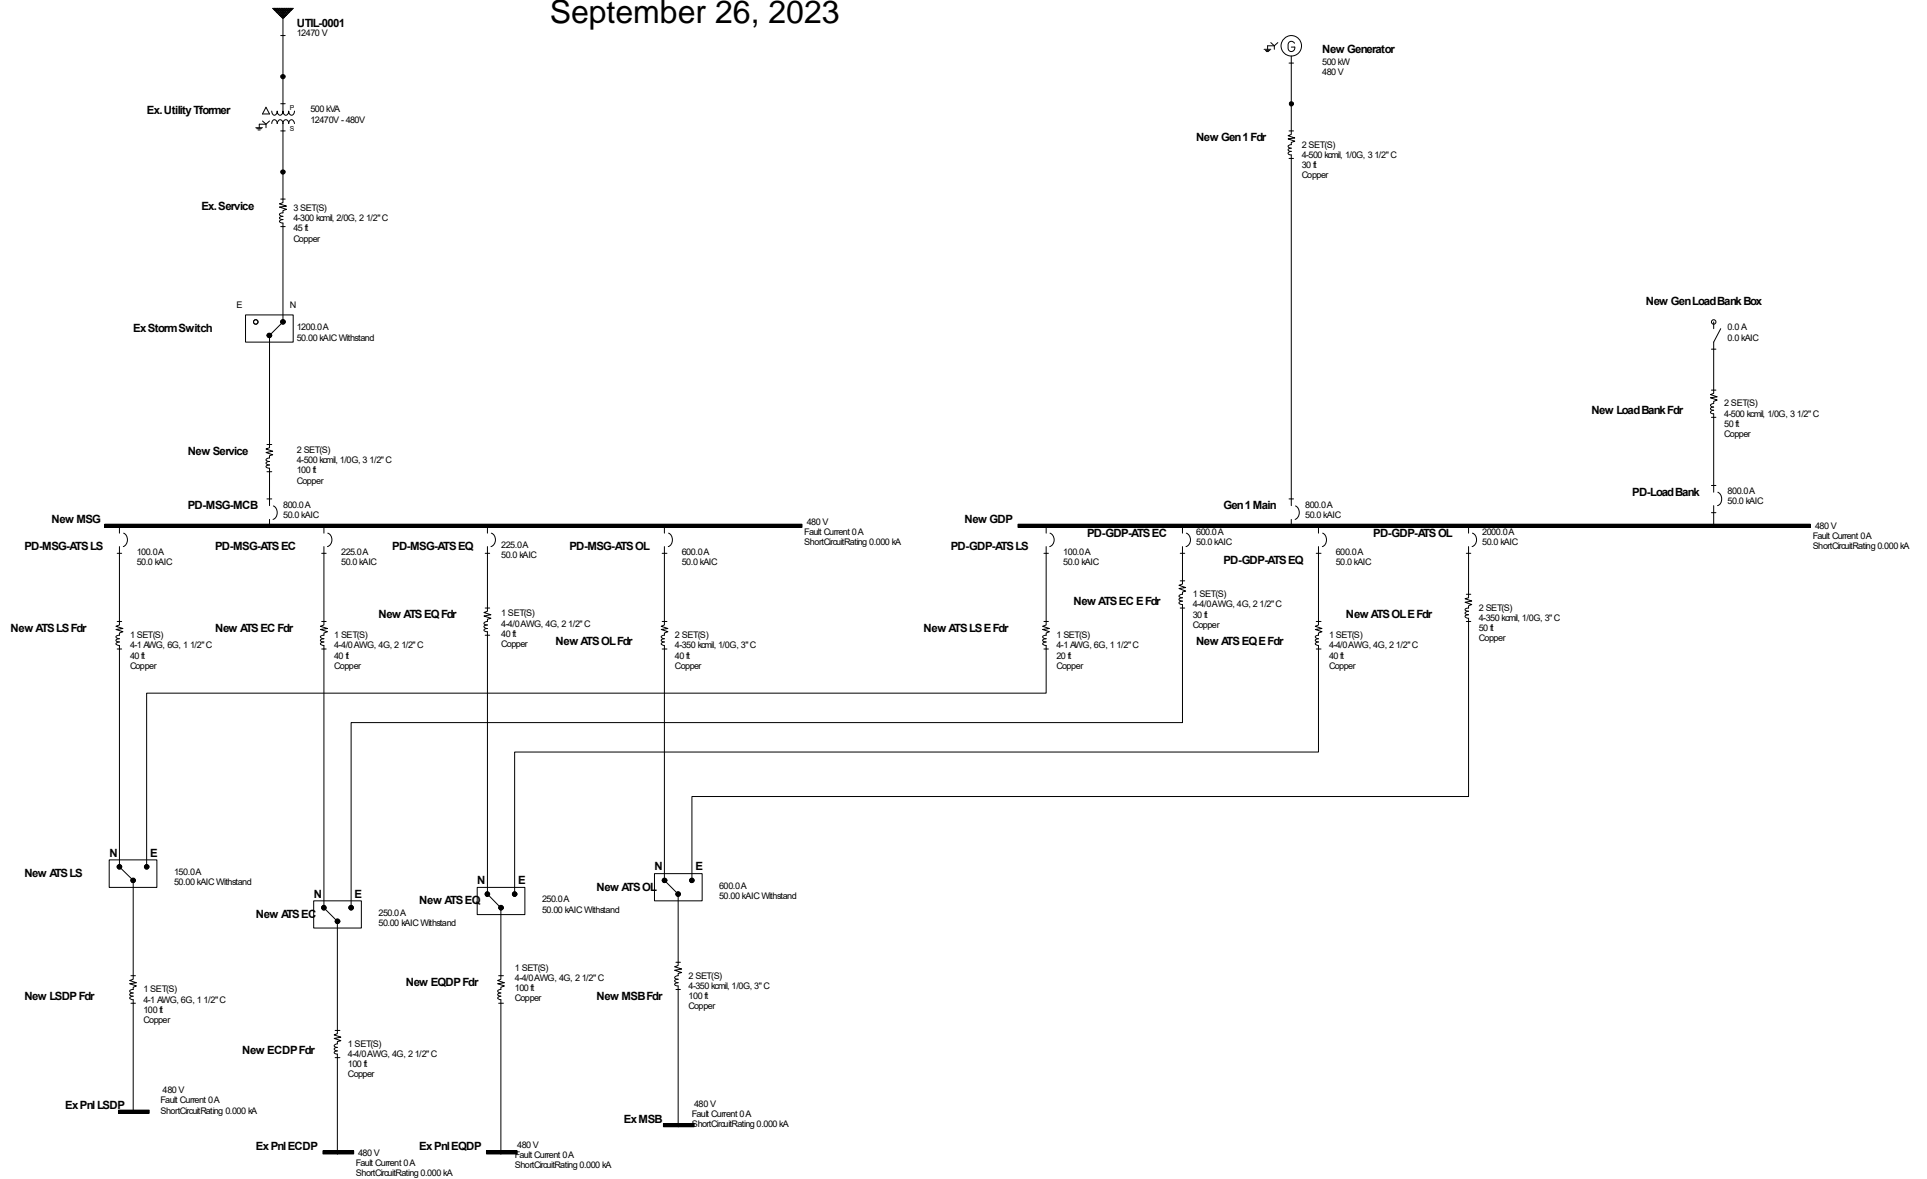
Proposed layout of new powerhouse for the Forensic Building.
